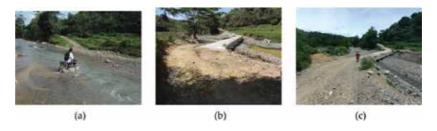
Conditions at the intersection with the river before and after construction: (a) Before the construction; (b) after the construction; (c) the conditions one year after the construction.
